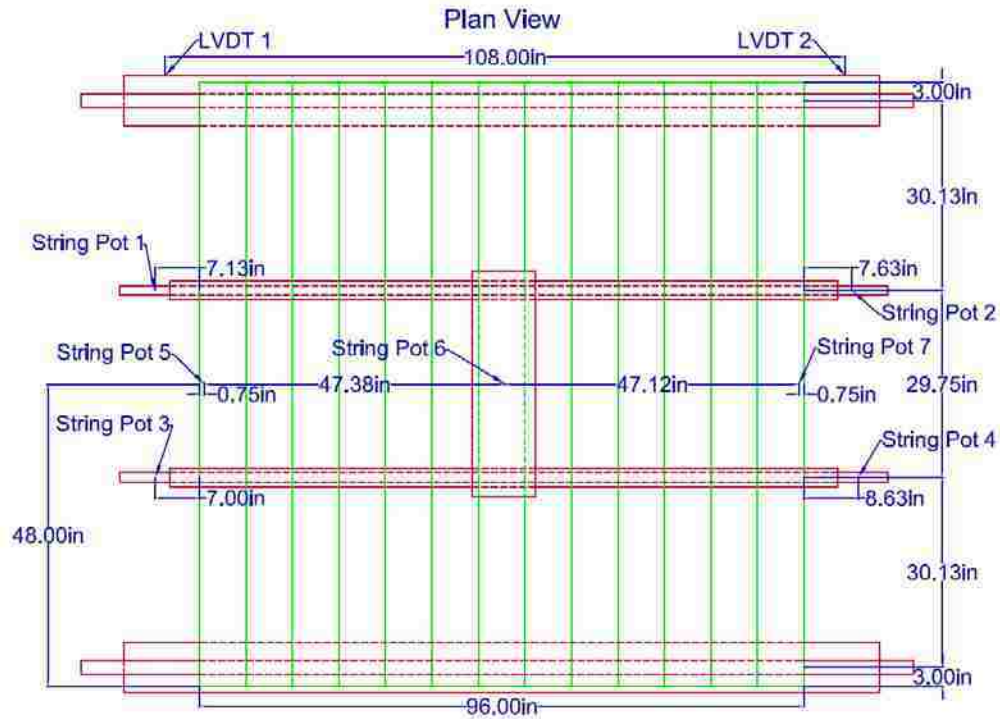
String Pot Locations for Out-of-Plane Loading Test, Looking Down
